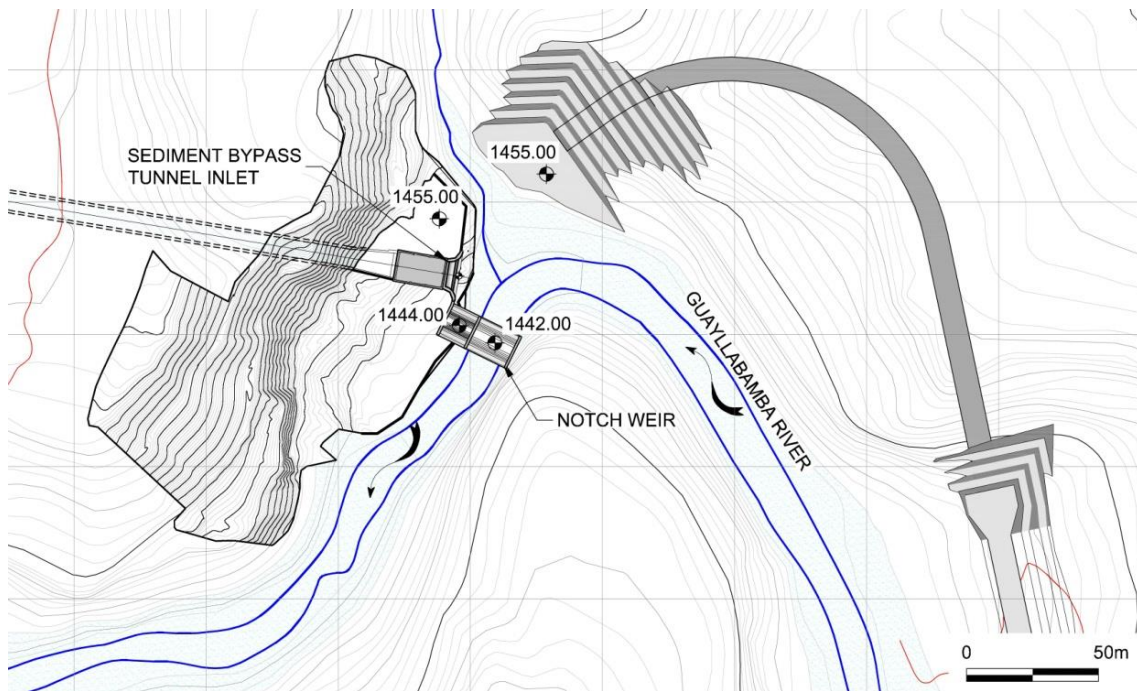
Plan view of the sediment bypass tunnel intake and the downstream notch weir
